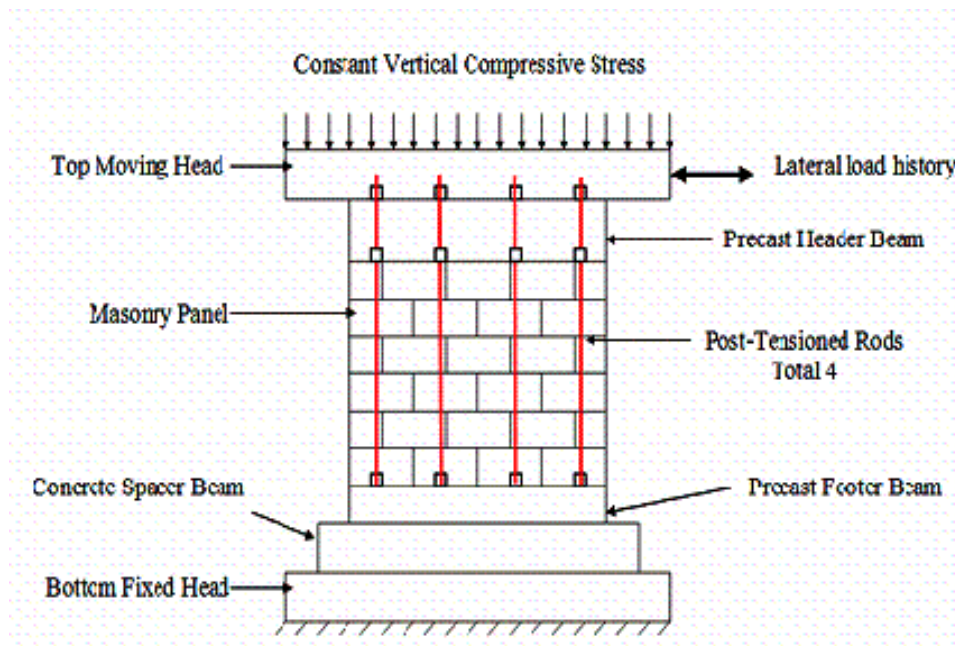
Masonry walls tested in United States of America (Schultz (1994))
